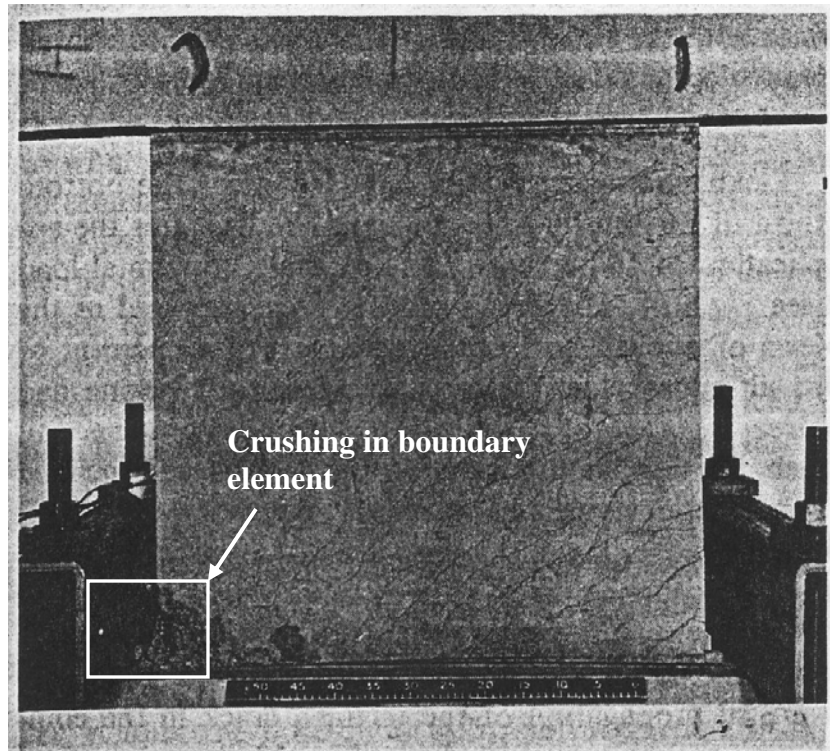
Cracking pattern for wall SW11 tested by Lefas et al. (1990) at compression zone failure
